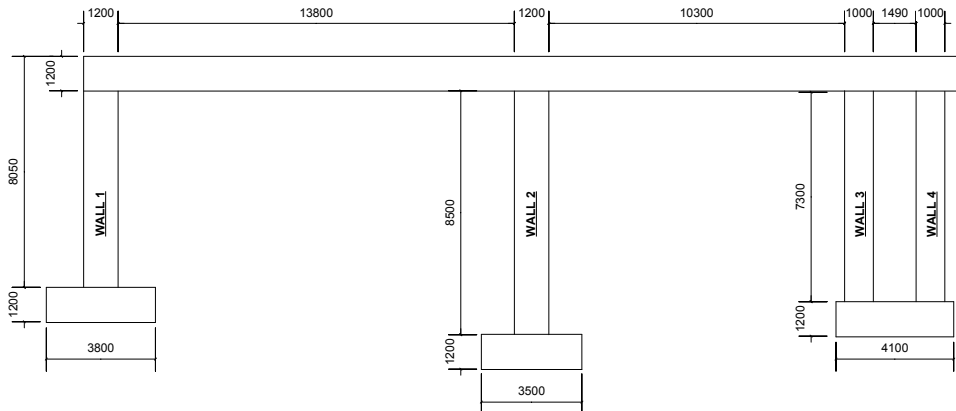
Cross-section of studied tunnel geometries. Segments are 17.5 m long.
